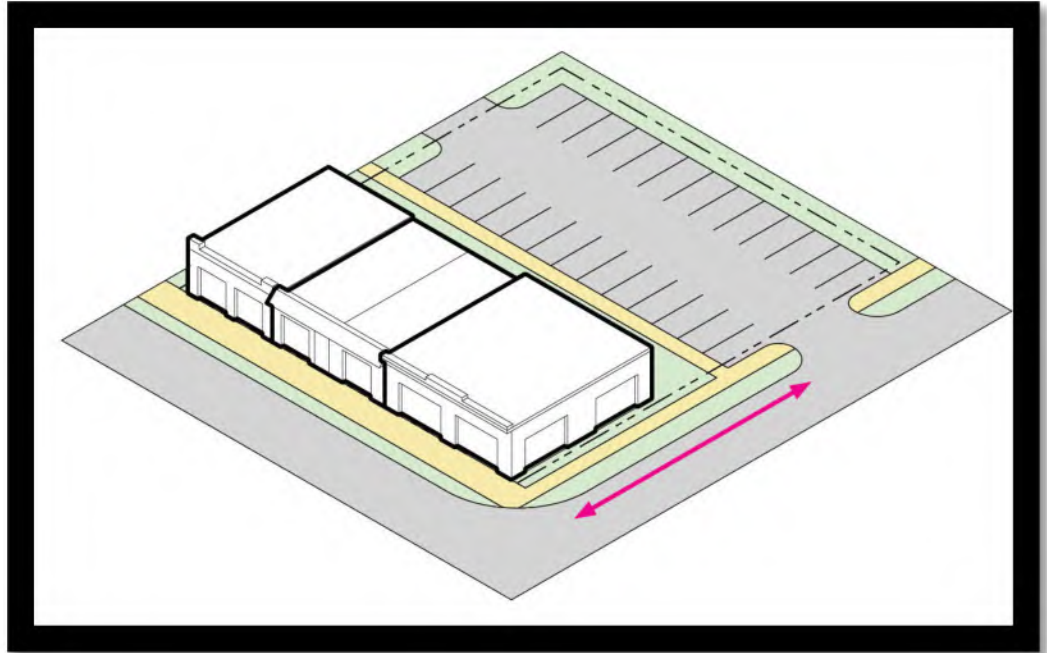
Figure showing the separation of the parking lot accessway and the nearest intersection (represented by the pink arrow).
